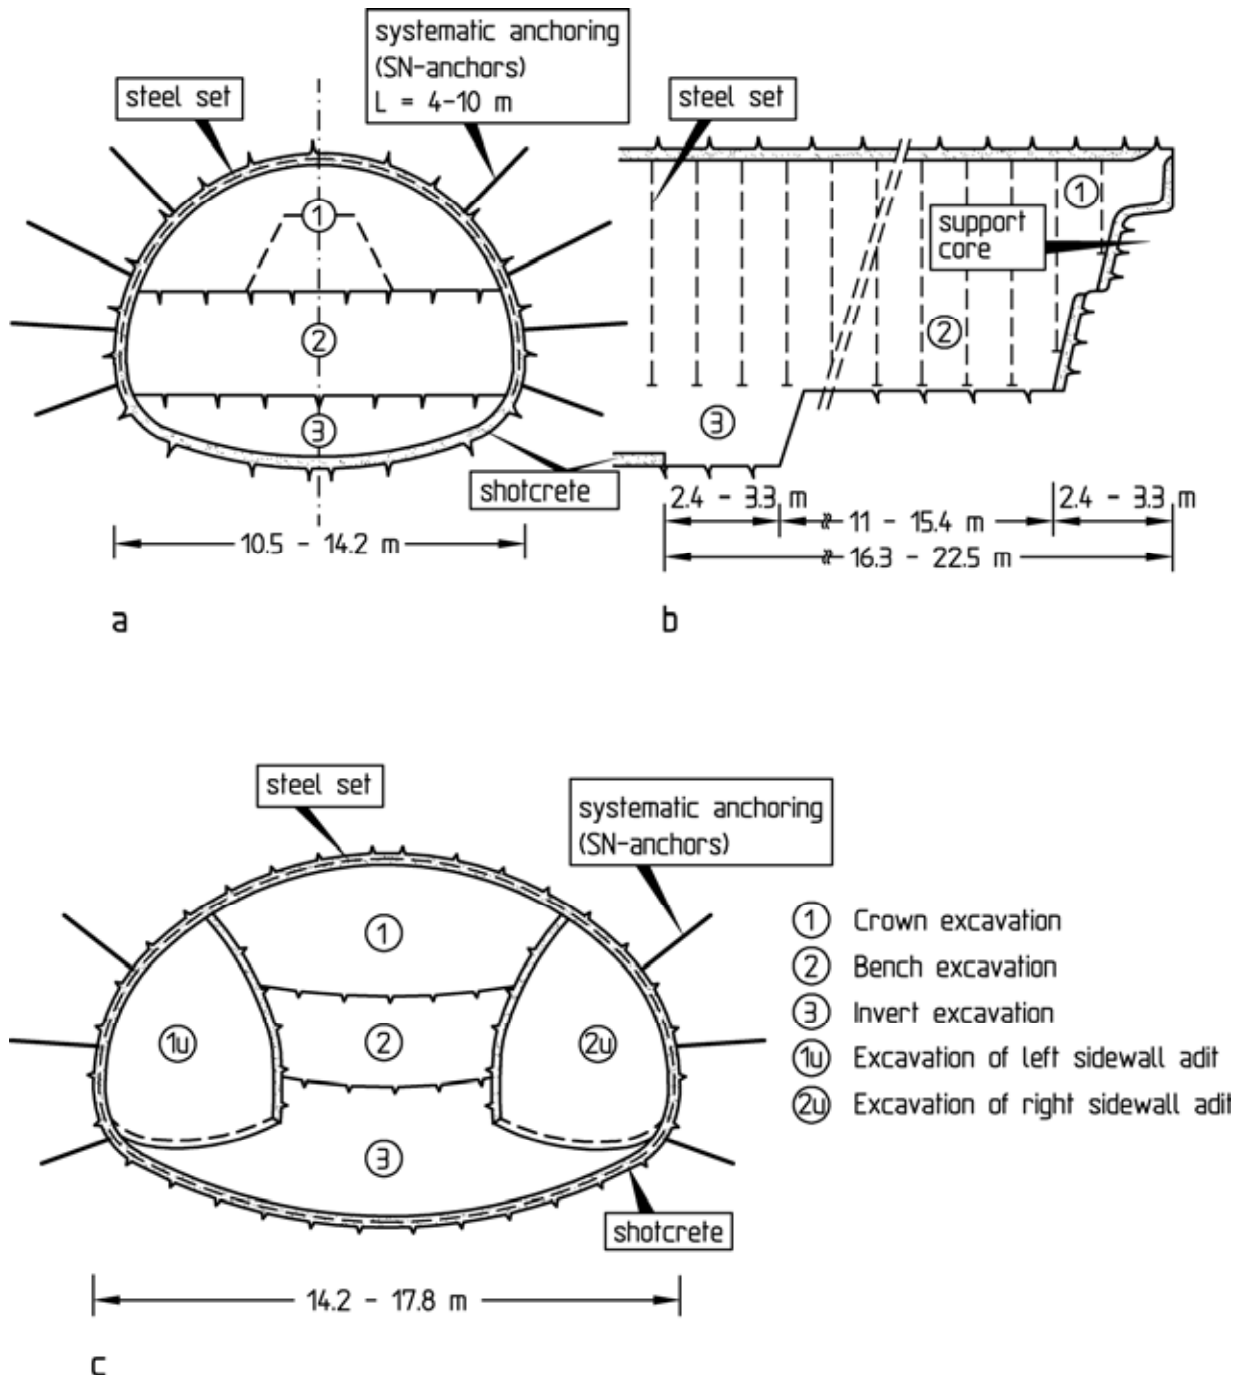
Excavation and support: a) Crown heading, cross-section; b) crown heading, longitudinal section; c) sidewall adit heading, cross-section
